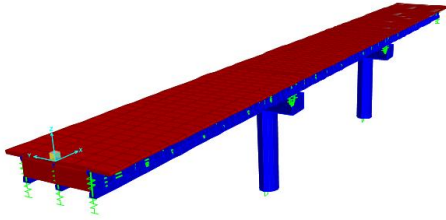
Model of PC-I girder bridge (Brg. No.5)
